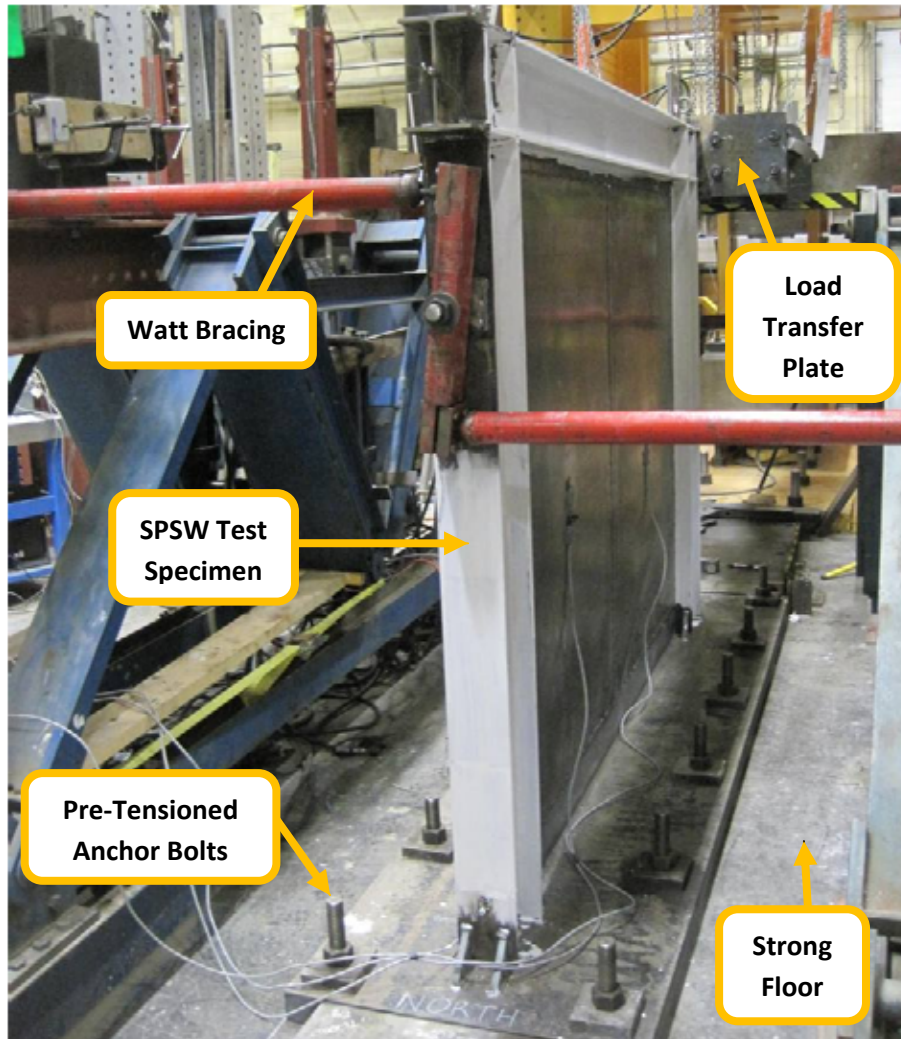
SPSW Specimen in Testing Frame, Prior to Load Application
